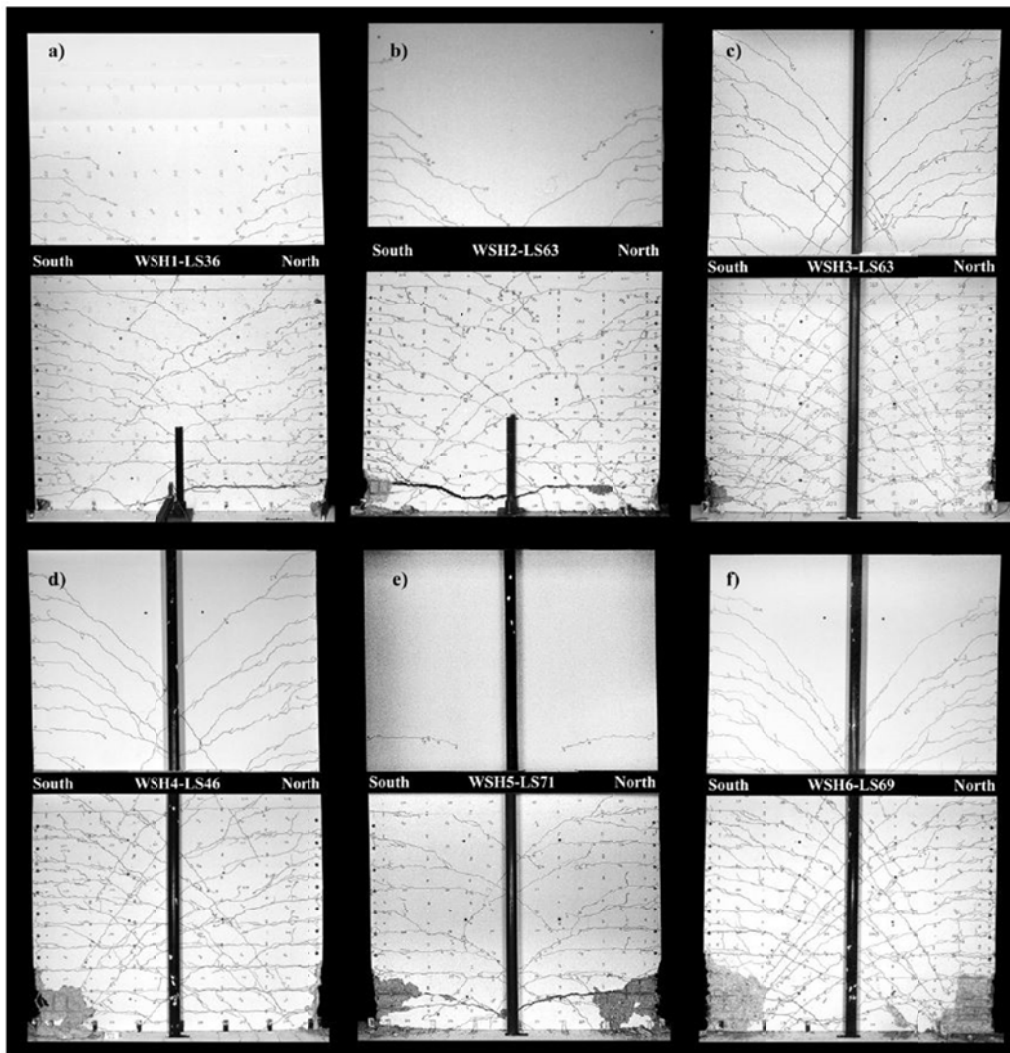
Damaged specimens of Dazio et al. (2009)
